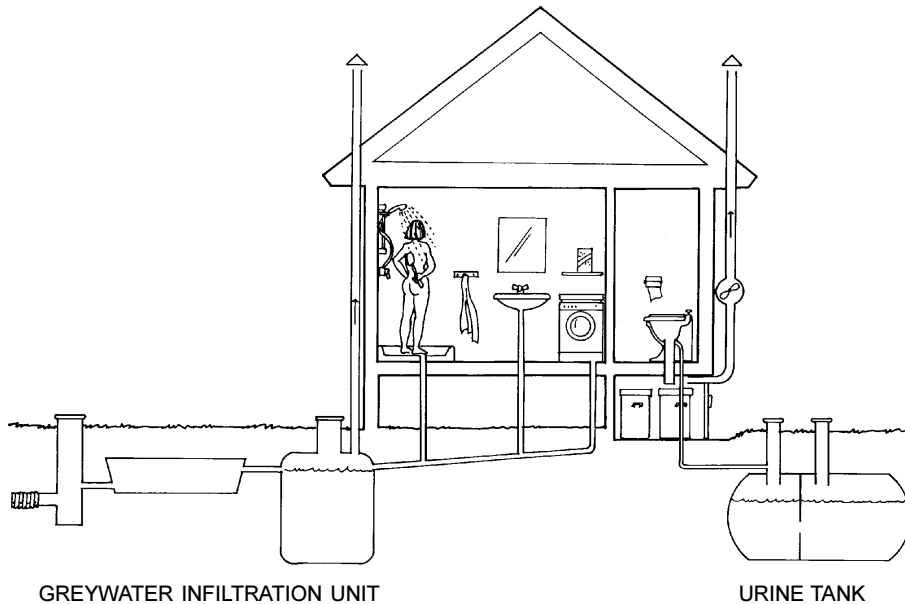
A house in Sweden with a dehydrating toilet, urine diversion and storage in an underground tank (see Section 3.1.3) and on-site greywater treatment.
